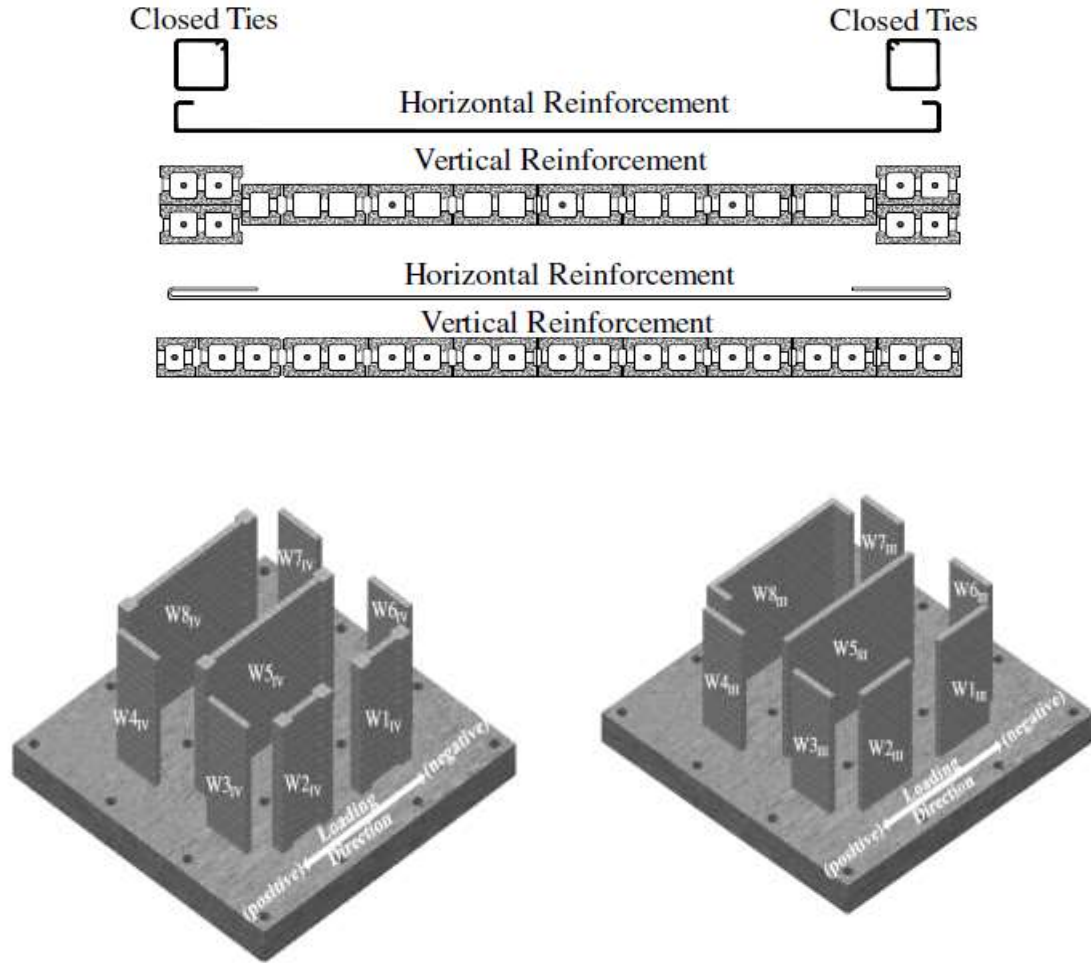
Buildings Configuration and Walls' Cross Sections
